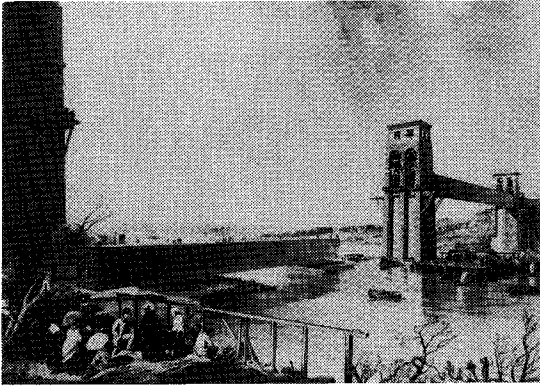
Construction of Britannia Bridge (Completed in 1850)
